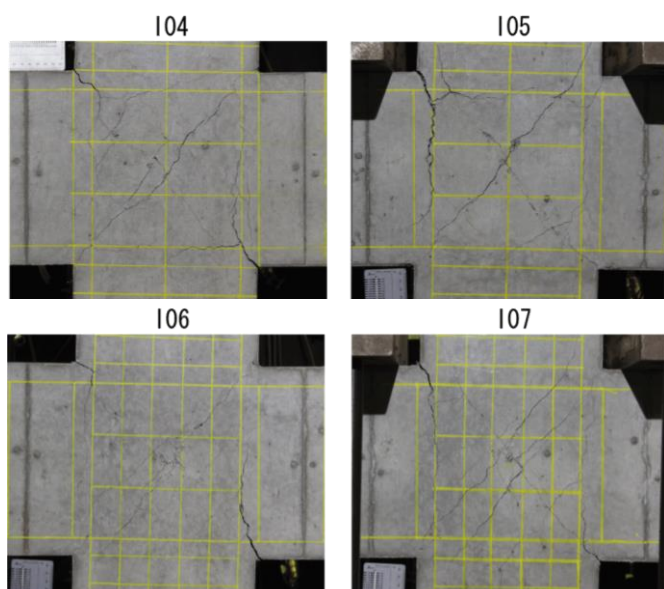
Typical damages of beam-column joints at story drift.
